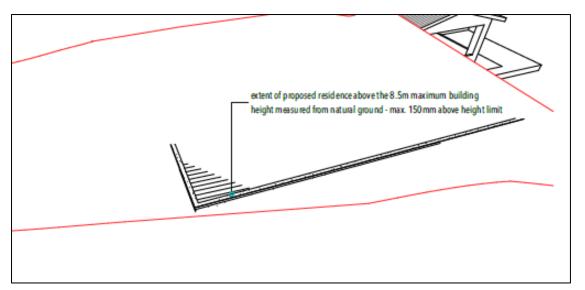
Extent of proposed dwelling above 8.5m Source: New Paradigm Design
